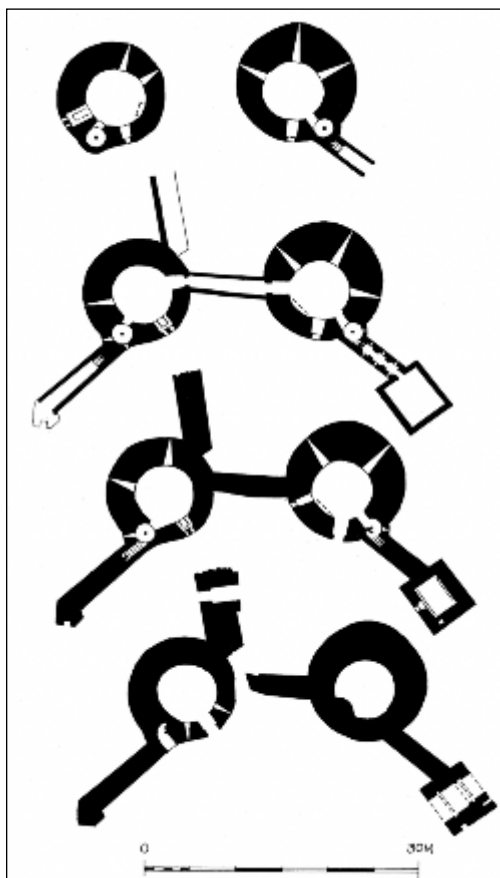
Cilgerran. Tower floor plans; reconstruction of original layout, based on plan in Hilling 2000. Note latrine at end of east curtain (left) and latrine shaft and drain in gatehouse (bottom right).
